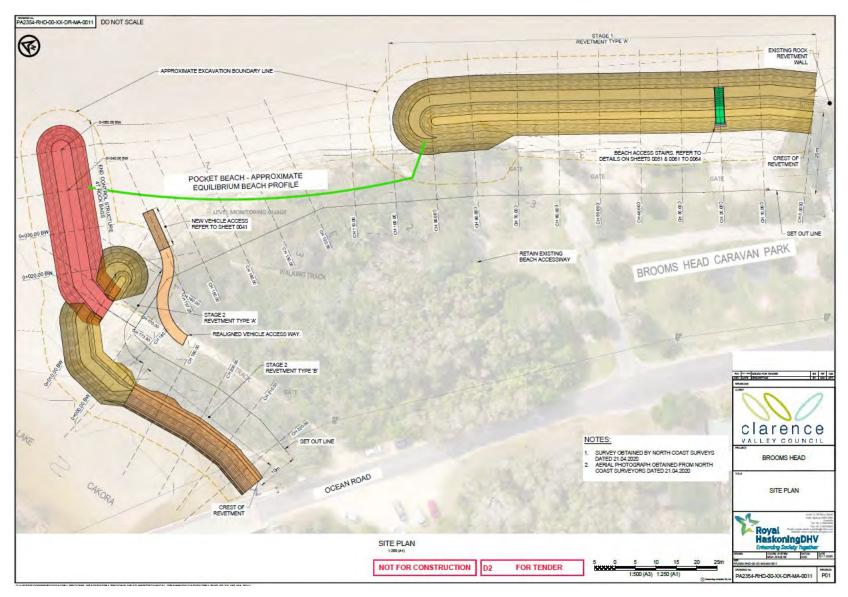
Brooms Head revetment extension - stage 1 and 2 site plan
